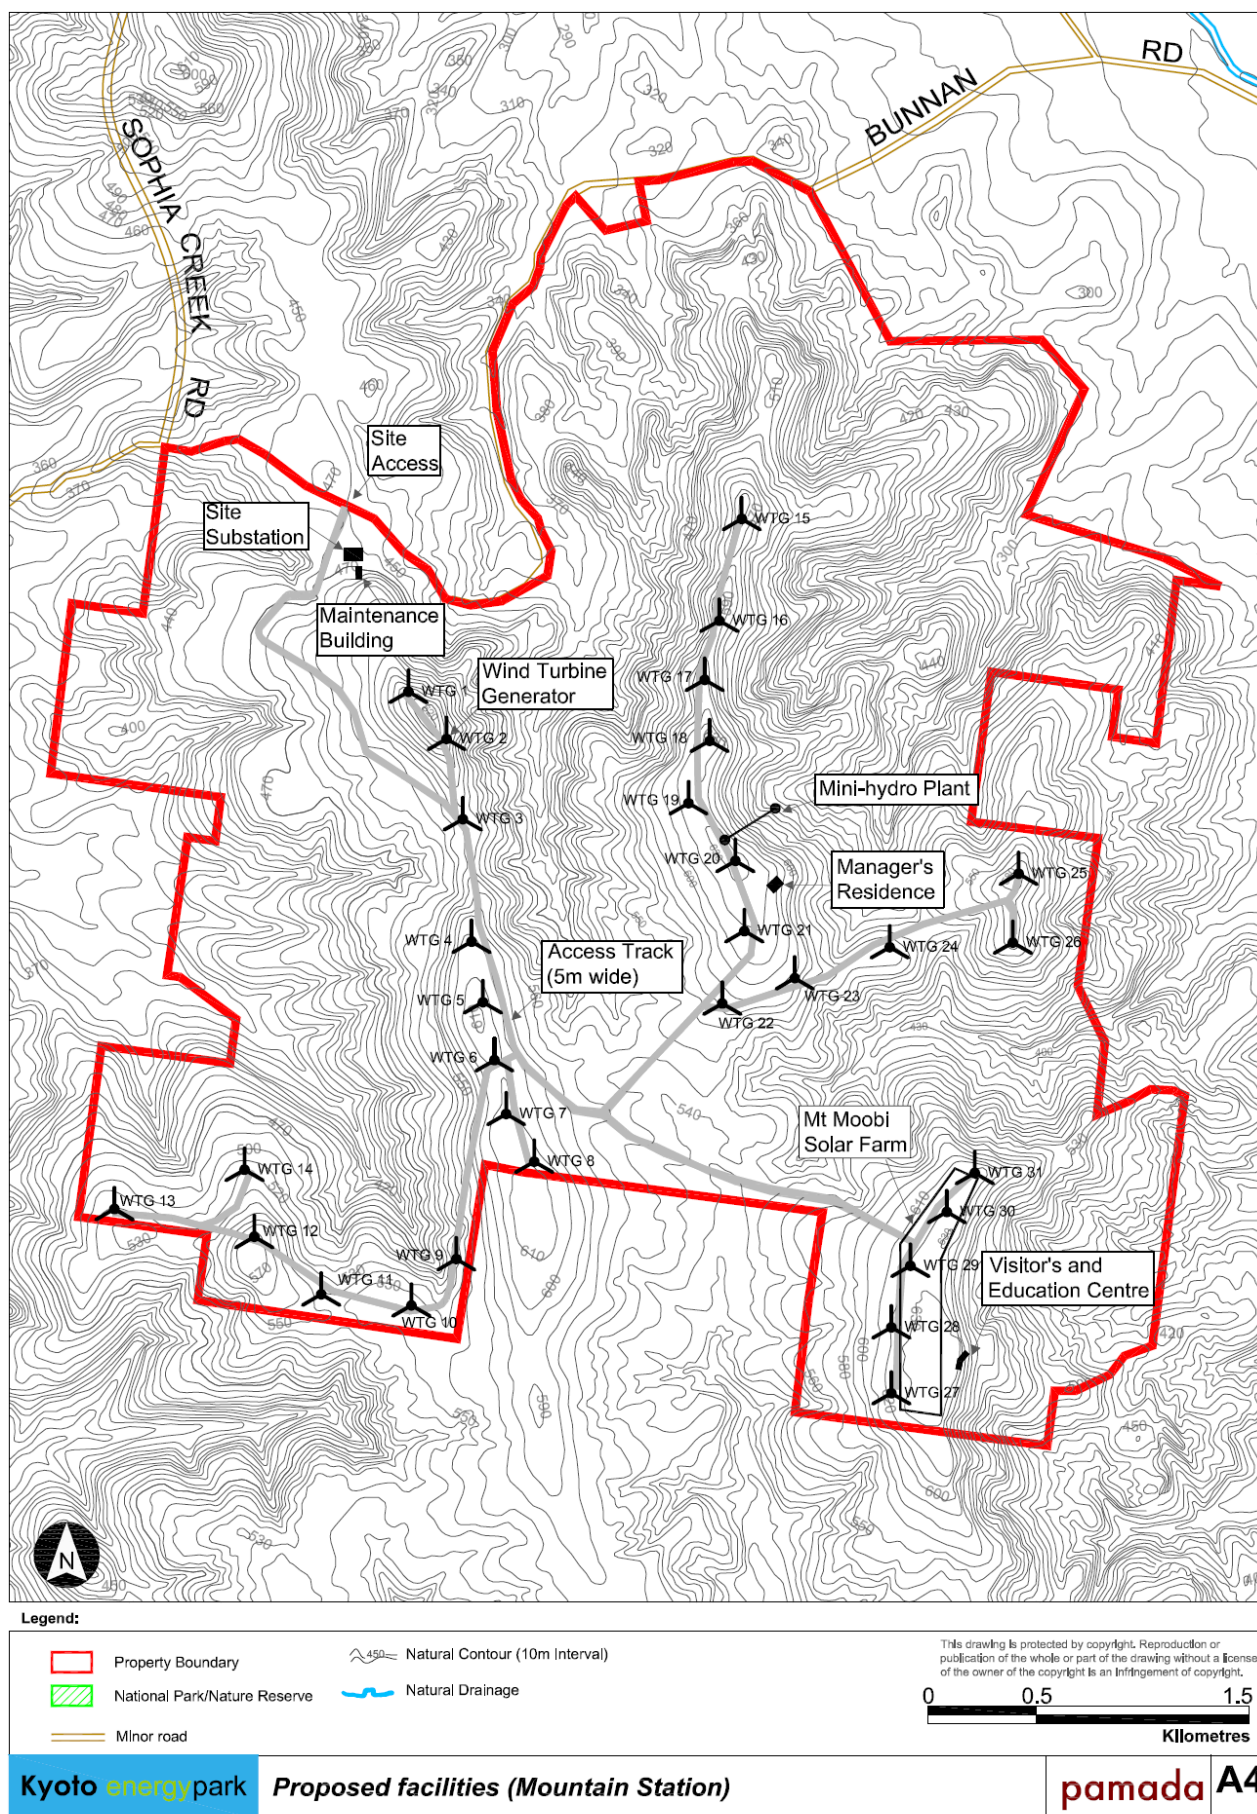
Final Layout of Proposed Facilities (Mountain Station)
